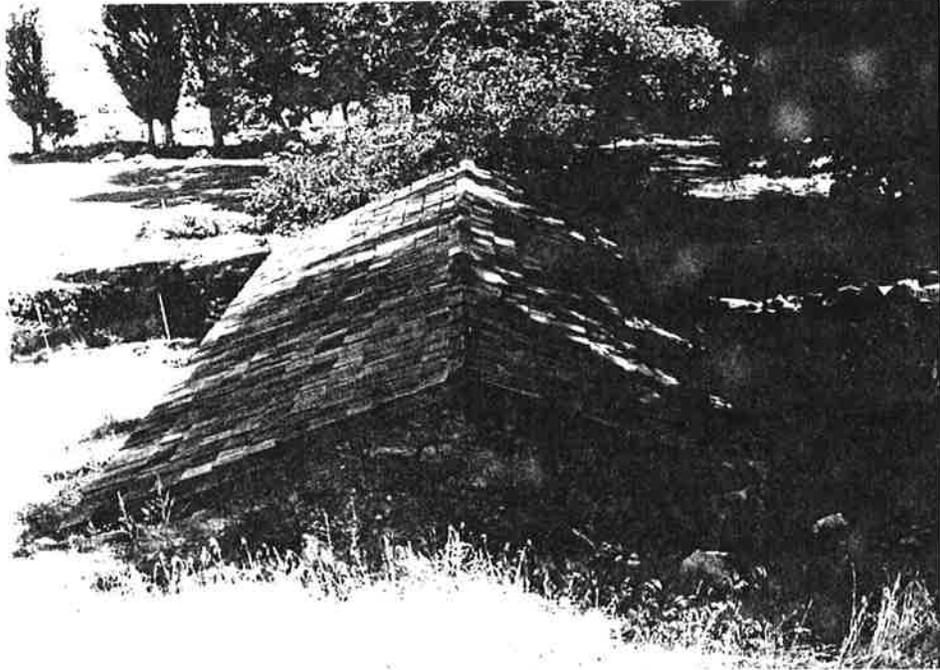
Birch Creek root cellar, showing west elevation from hillside. Roof was rebuilt by BLM in September 1993. (Neg. R3-13)
